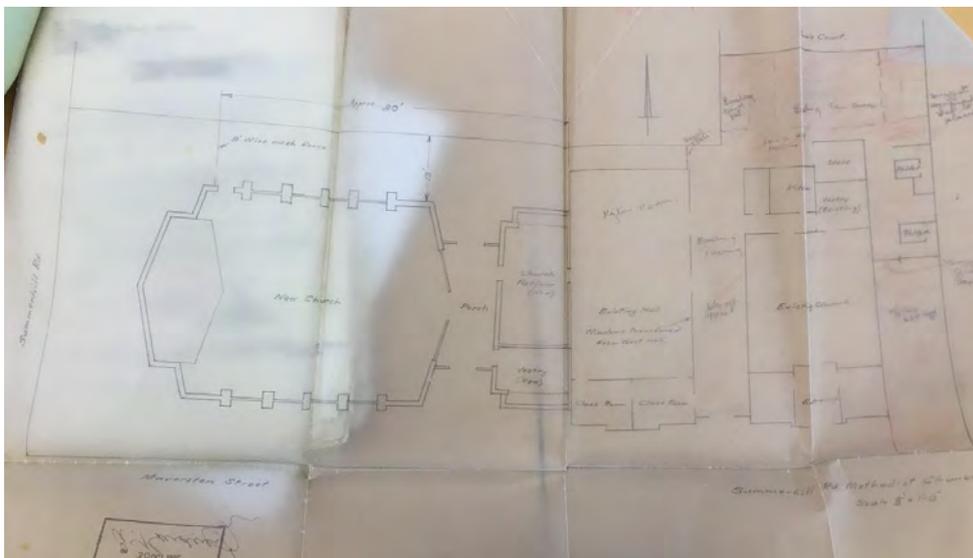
Site plan of the church complex c1965. (Source: Public Records Office of Victoria)
